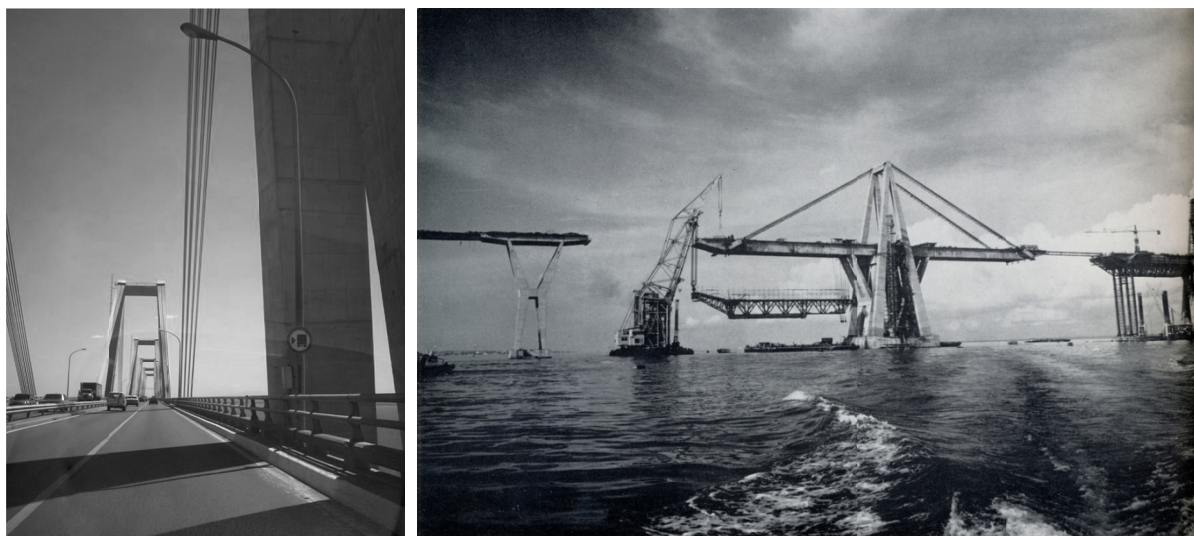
Maracaibo bridge, deck and pylon view, in exercise (left side); lifting construction deck operations (right side)
